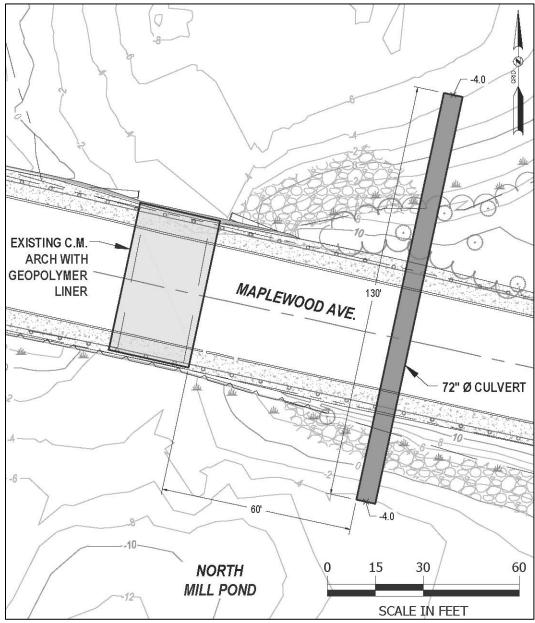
Bridge Rehabilitation Alternative 2.3 schematic plan
